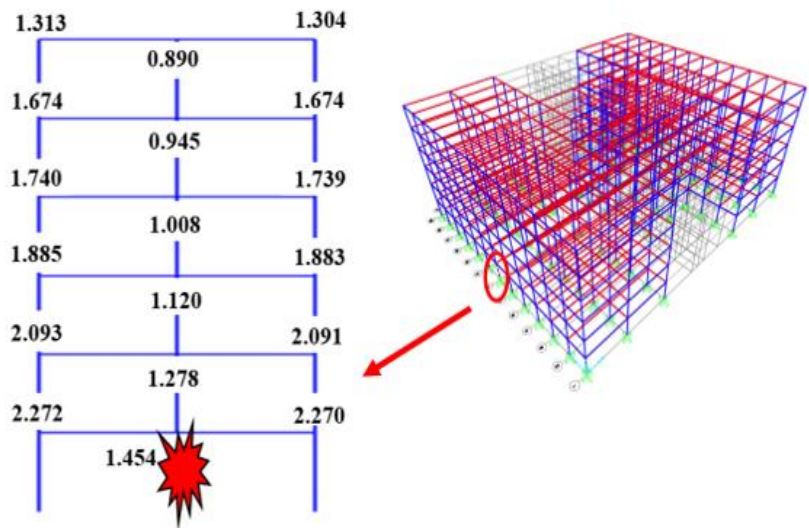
DCR of beam sections in Y-Z plane after removing Middle Column on Shorter Side C165 (case 2)
